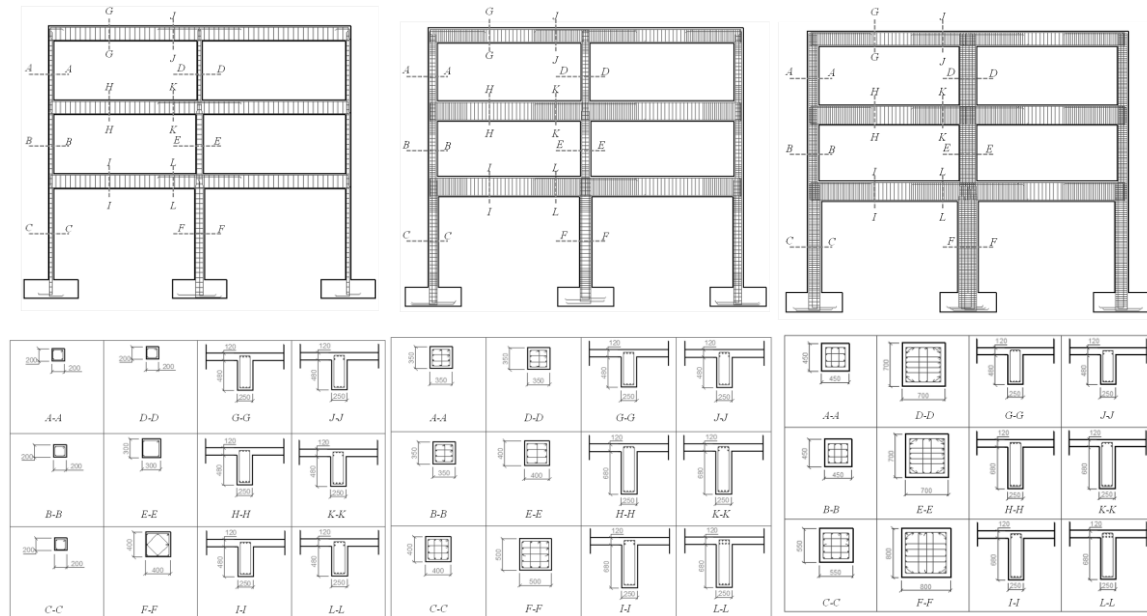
Concrete dimensions and reinforcement for gravity (*left*), direct (*middle*) and capacity (*right*) designed frames (all longitudinal bars are # 7 and all stirrups are # 3 bars)
